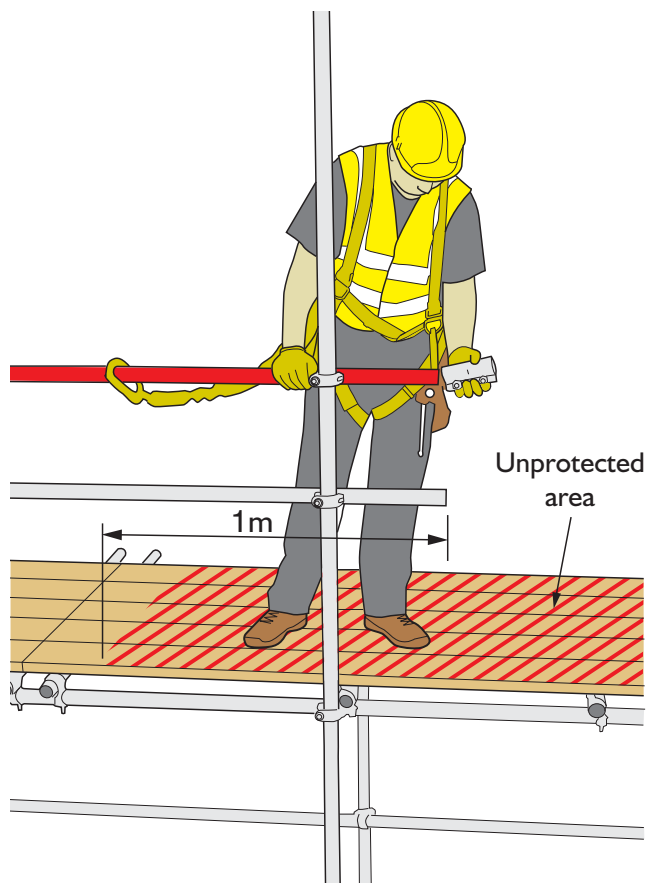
Shows a scaffolder exposed to a risk of falling at a leading edge (within 1 metre from the edge of the scaffolders' safe zone).
